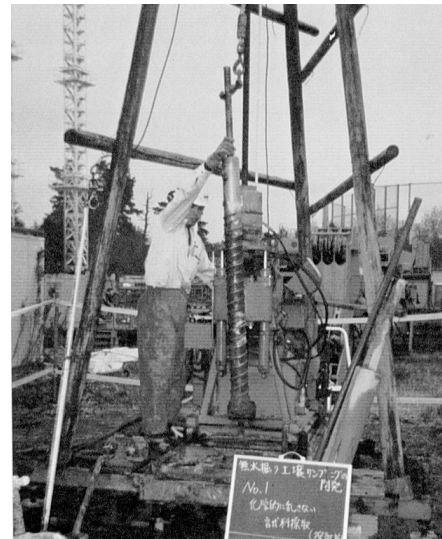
Drilling ability test by using the screw-type sampler (Example of a rotary-type boring machine).
